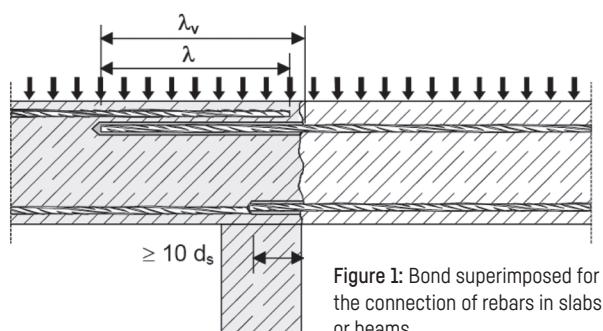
Bond superimposed for the connection of rebars in slabs or beams.
